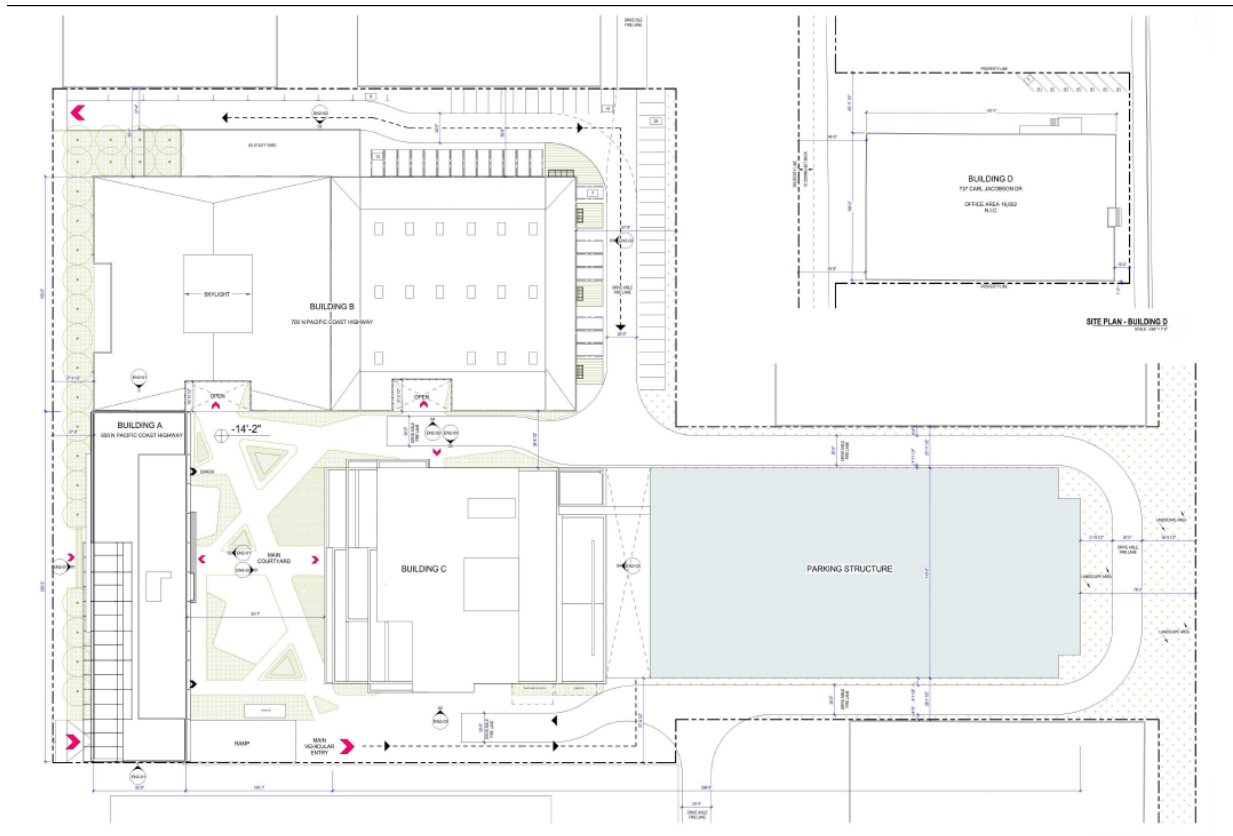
shows the project location and Figure 2 shows a Conceptual Site Layout.
